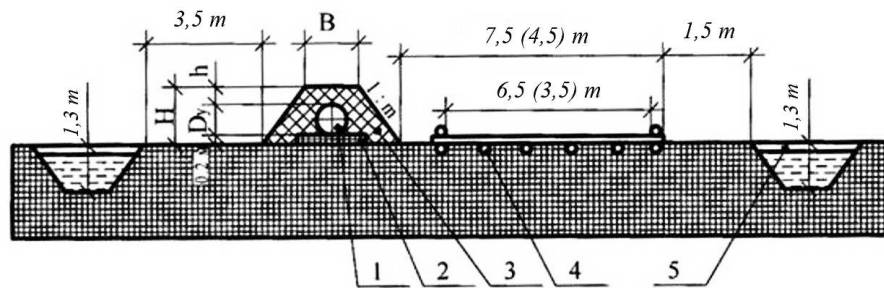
Diagram of pipeline laying on surface of flooded soil or marshland:
